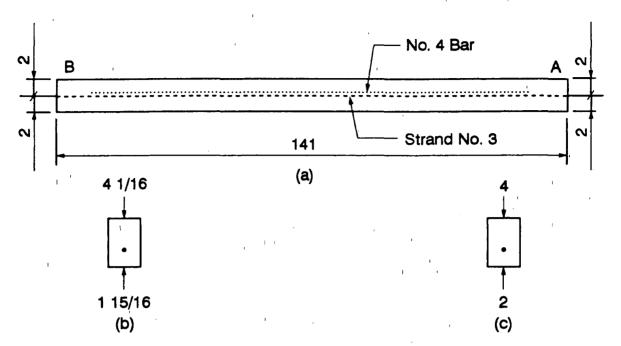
Specimen No. 10-6.0DU-3 (dimensions shown in inches):
